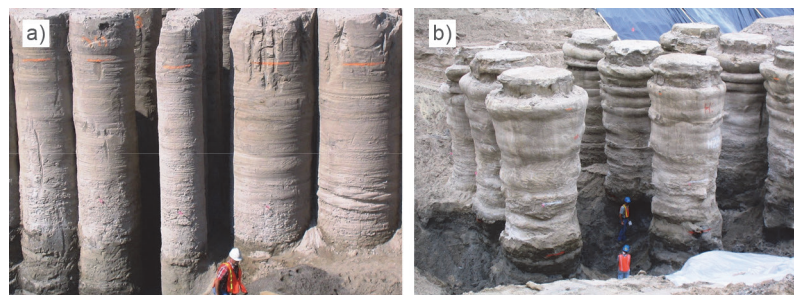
Excavated deep soil mixing columns (a) and jet-grouting columns (b), obtained from [8], constructed as part of the Tuttle Creek Dam project
